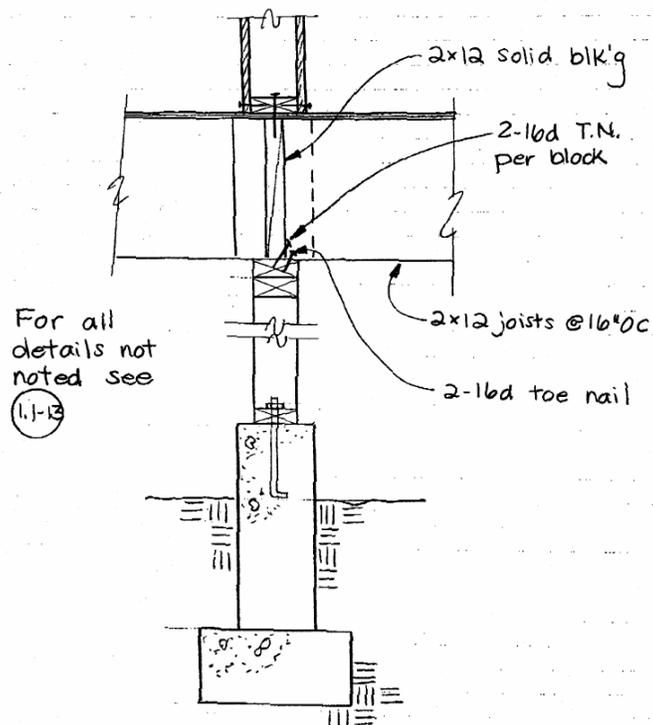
Interior cripple wall perpendicular to joists (detail 13-S2)
